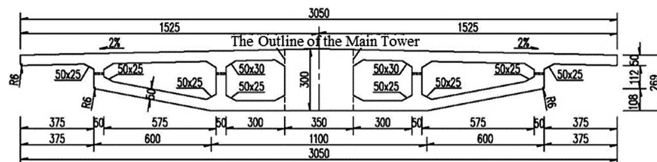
Cross-sectional diagram of the main bridge of Jinzhou Bridge (1) (mm)
